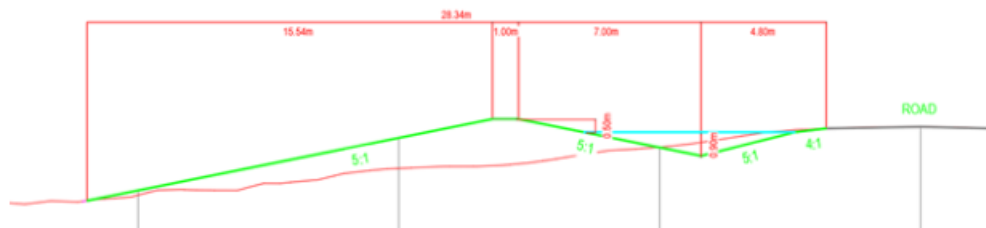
Engineering cross-section of diversion channel / bund along SH6 frontage
